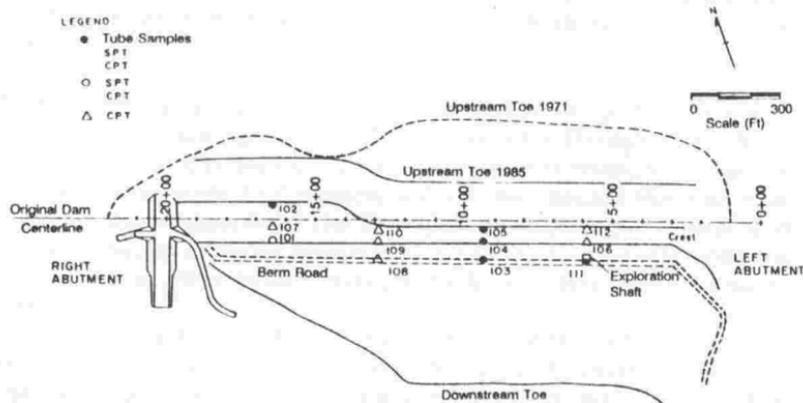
Plan View of Lower San Fernando Dam Showing Locations of Borings and Exploratory Shaft
